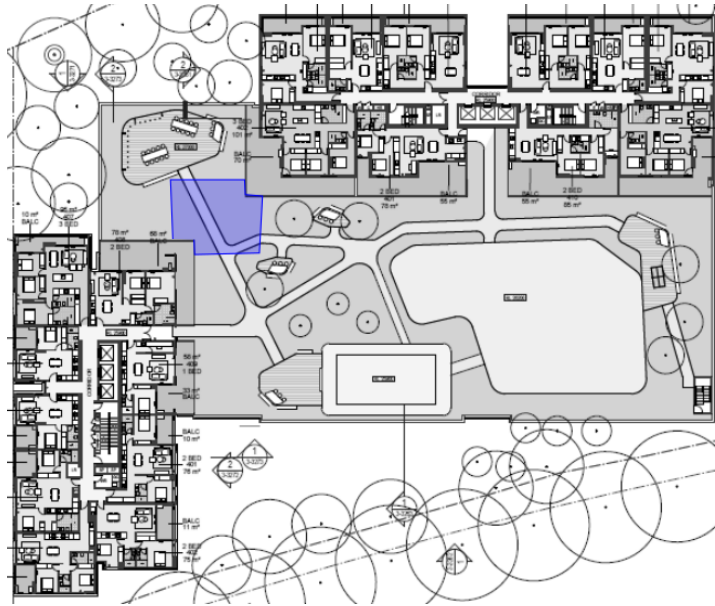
Mitigation measures – Connecting corner awnings to both buildings 6 and 7.
